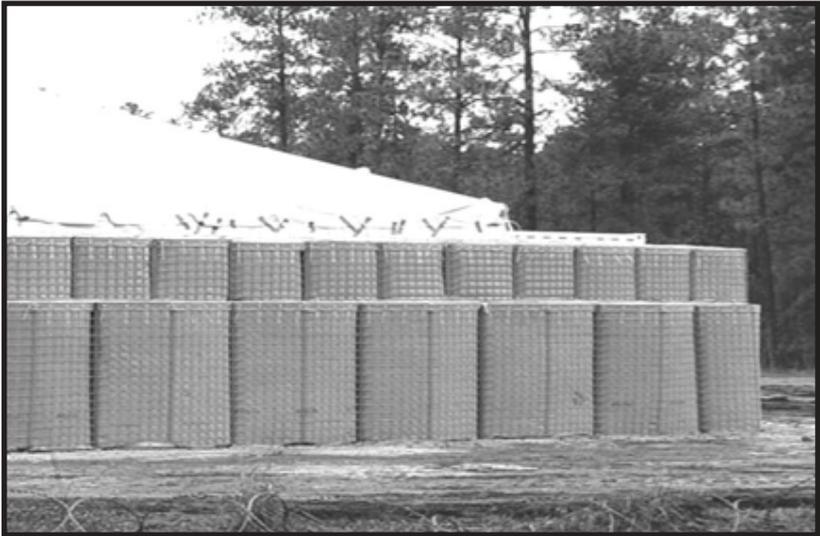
Soil-filled geotextile (wire and fabric) containers for sidewall protection
